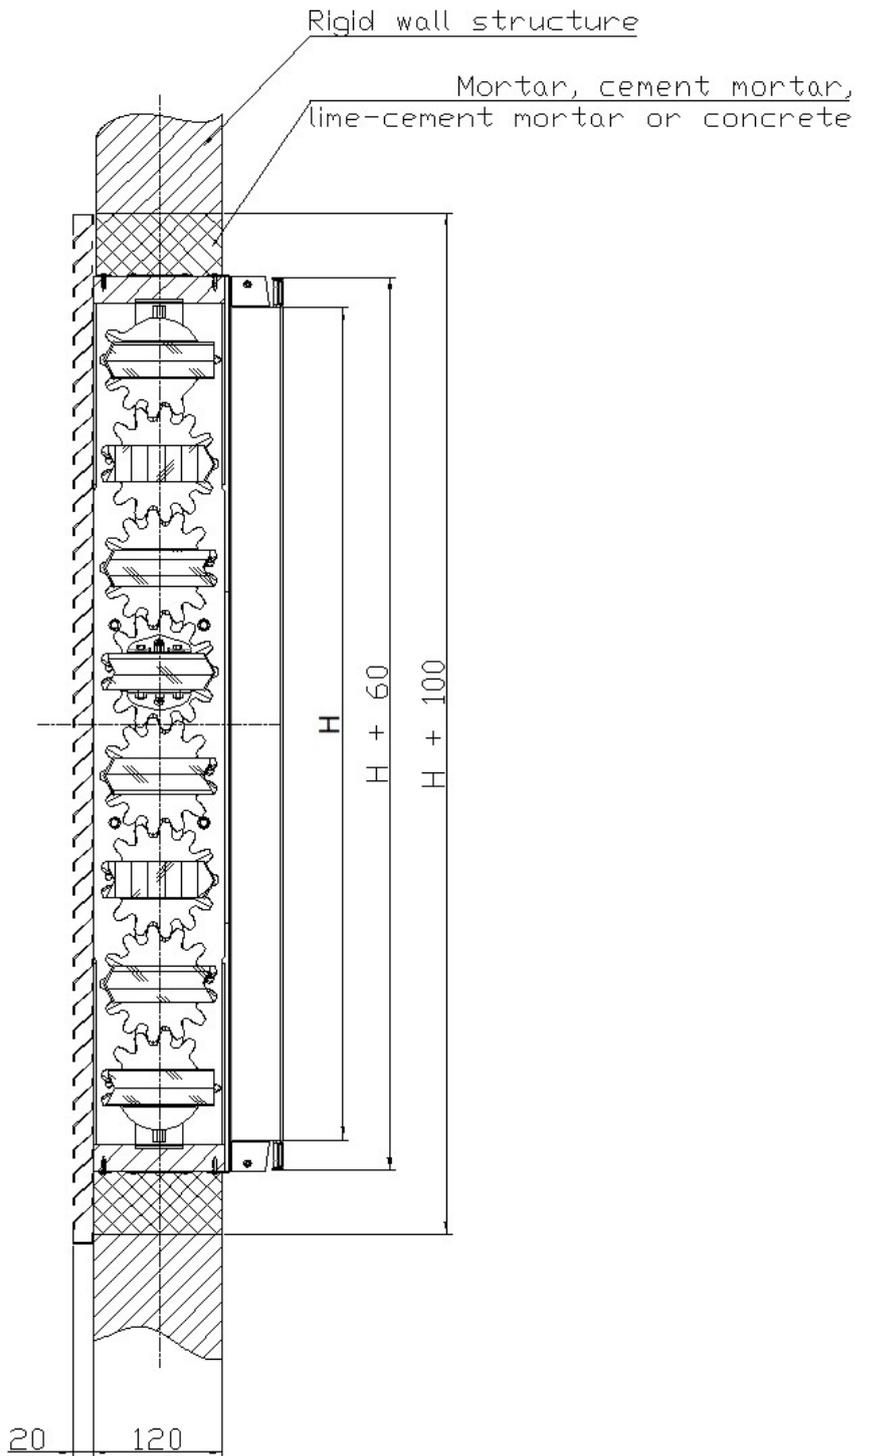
Installing method of WKP-O fire dampers in rigid wall with KST grille in rigid wall structure.
